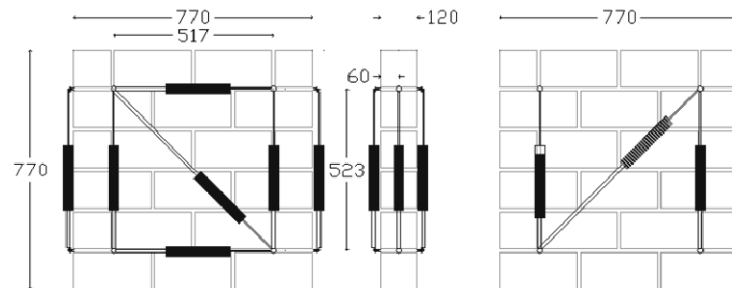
half-full brick panels layout of sensors on the wall compressed parallel to holes [mm]
